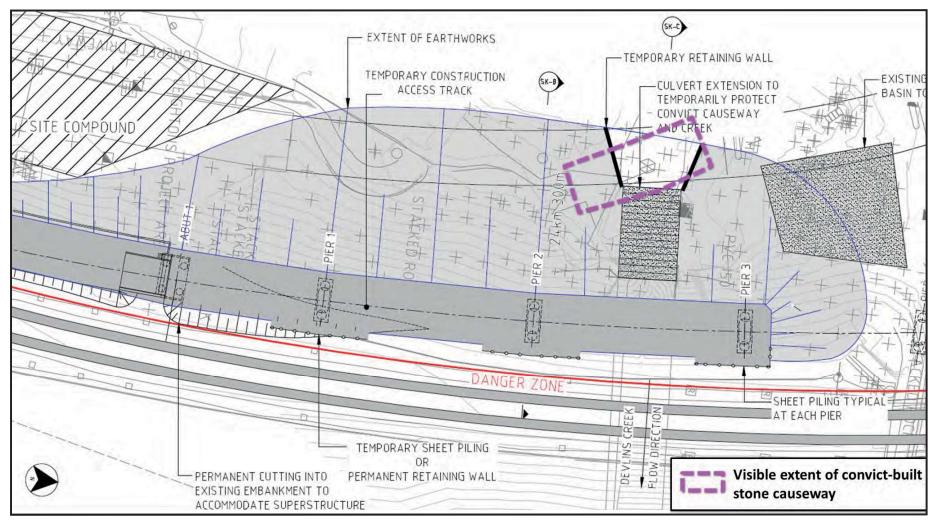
Development plan showing visible extent of convict-built stone causeway
